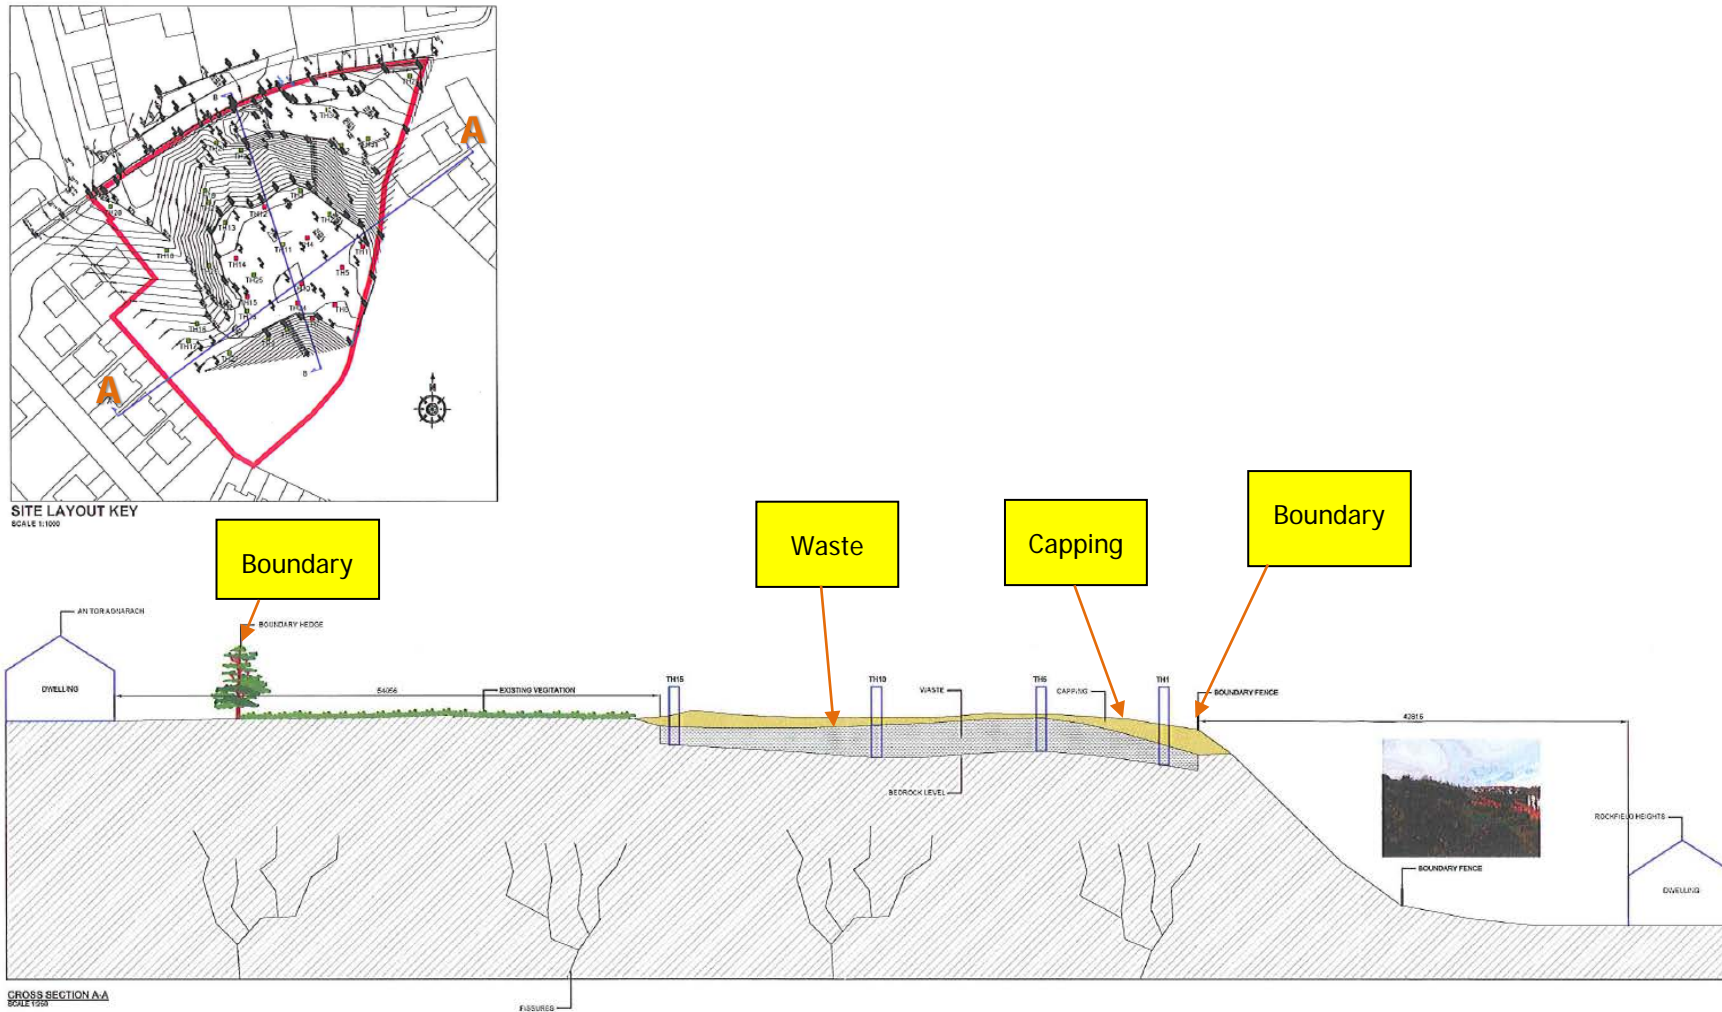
(a): Conceptual site model for Kingscourt Landfill site – Cross section A-A
